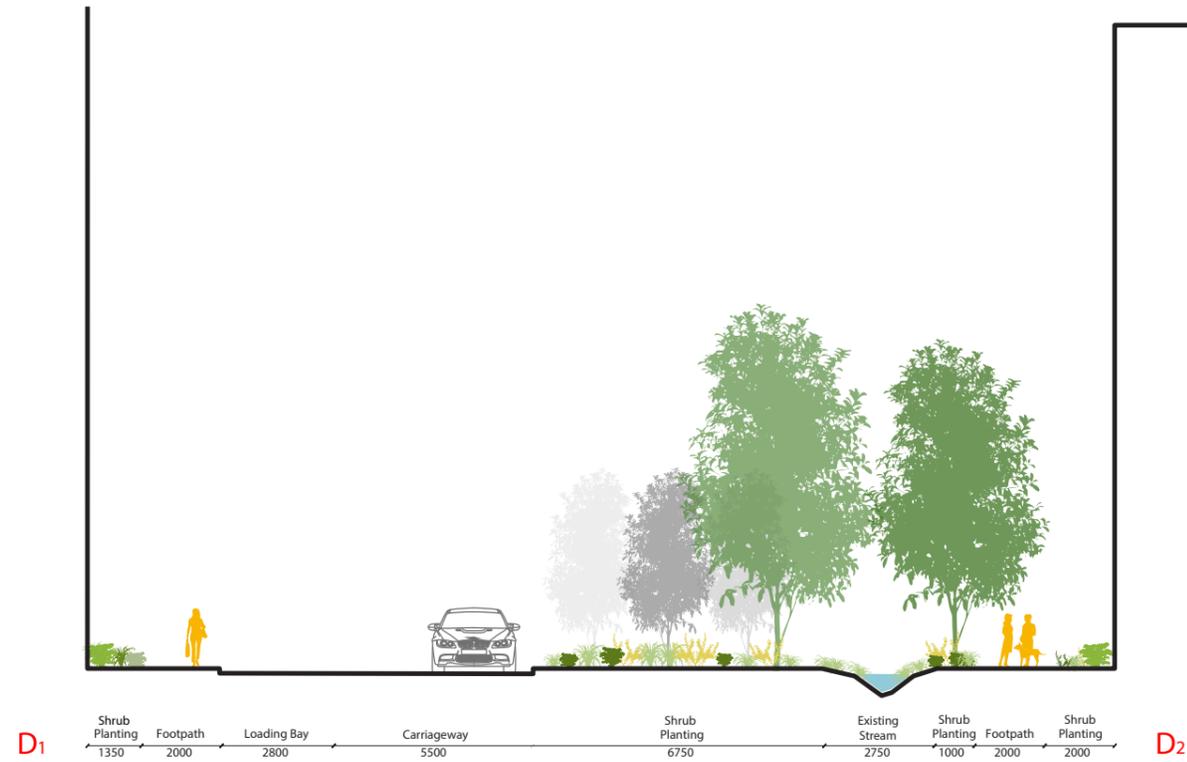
Section D1-D2 - Home zone / Local Road & Eco Corridor
